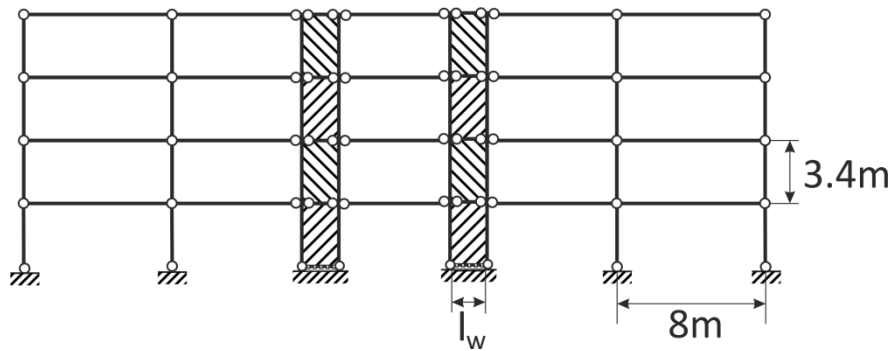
SECTION OF THE STRUCTURE (TWO INNER SHEAR WALLS)
